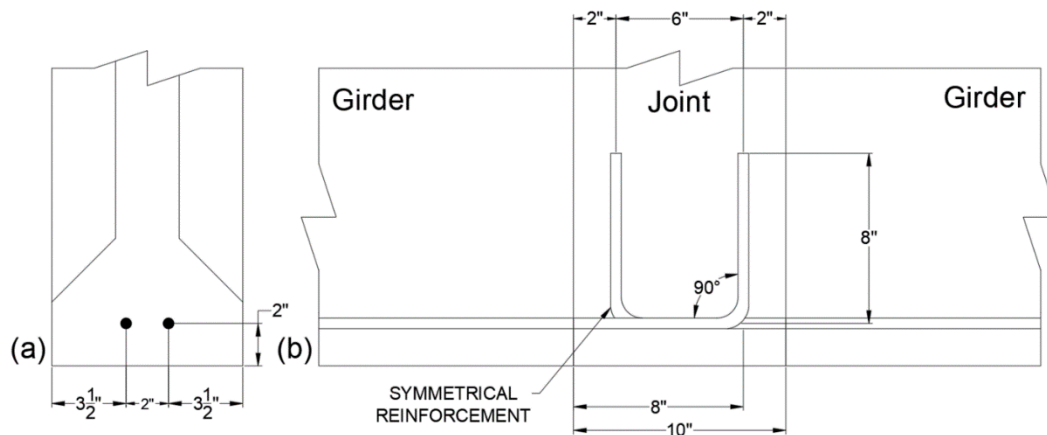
Positive moment hook cross-section (a) and elevation (b) view
